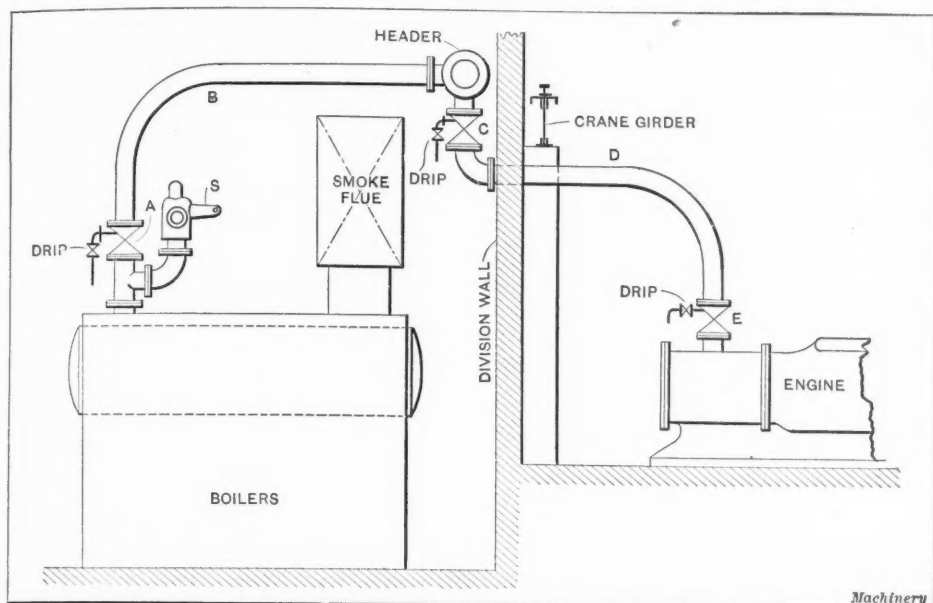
An Example of a Poor Arrangement of Piping from Boiler to Engine
